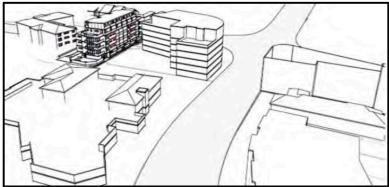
View from east looking west along Liverpool Road. Eastern façade of the building stepped to allow solar access to the south in the morning. The two upper levels above the height are setbacks significantly from the southern boundary and 14.435m of separation exists between upper levels and the RFB to the south.
